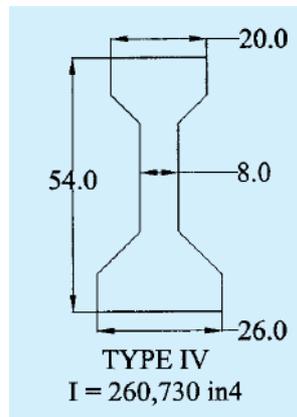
Sunshine Skyway Bridge (ID-11). Cross section of AASHTO Type IV girder (Kahn and Saber, 2000).
